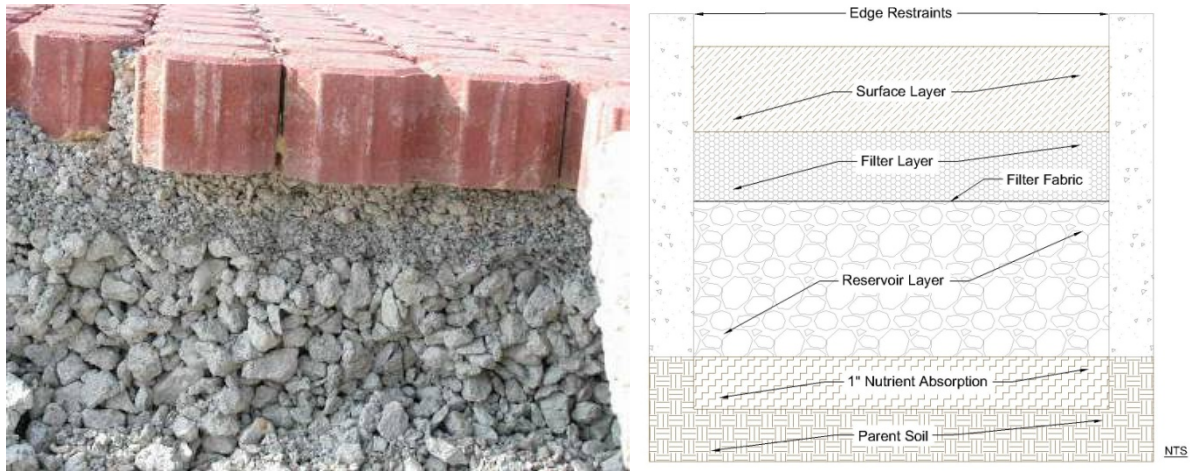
Typical Modular Paver Pervious Pavement System Cross Sections
